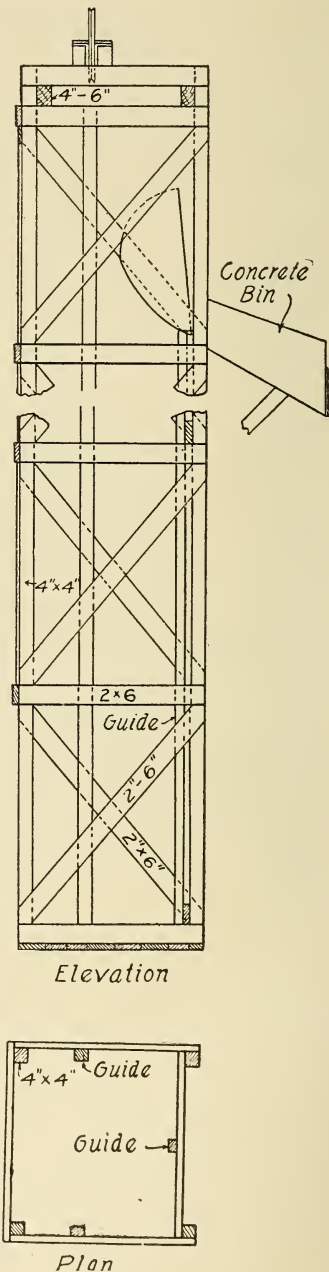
Detail of Hoisting Tower, with Automatic Dumping Bucket.
